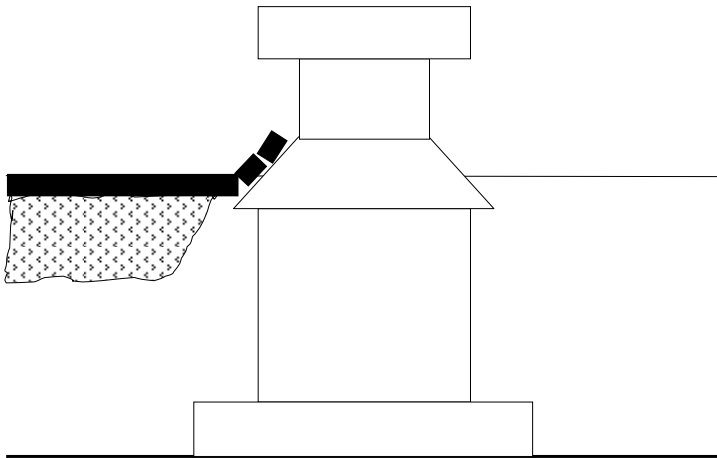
Platform with sloping section to fail the consolidated layer of a ridge with most of the keel failing against the vertical section.
